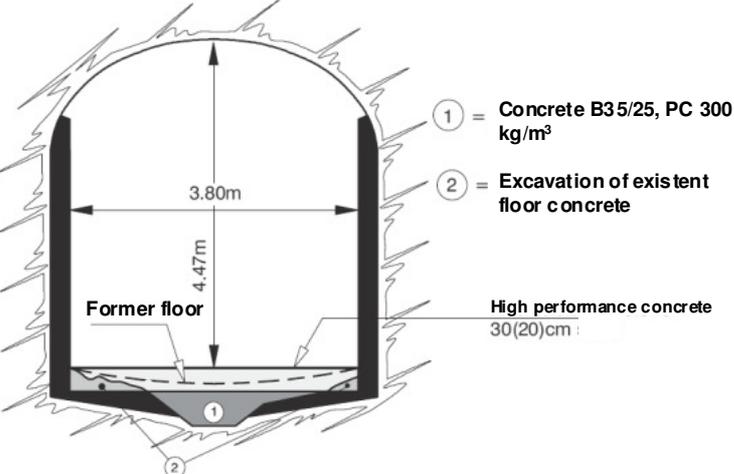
Cross section of the bypass tunnel. For abrasion reasons, instead of the concave a plane bottom has been installed (De Cesare et al 2008a)
